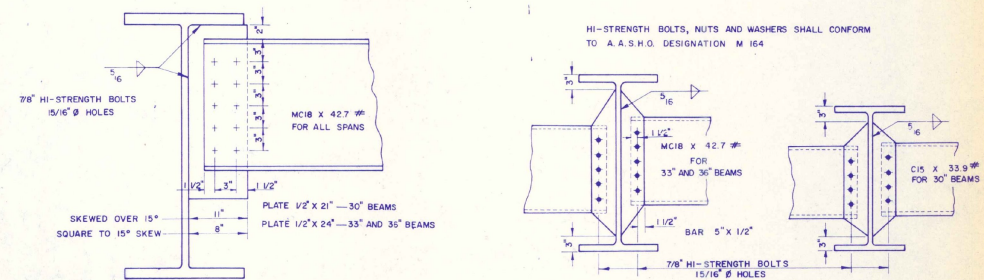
DETAILS OF PIER DIAPHRAGM CONNECTIONS
